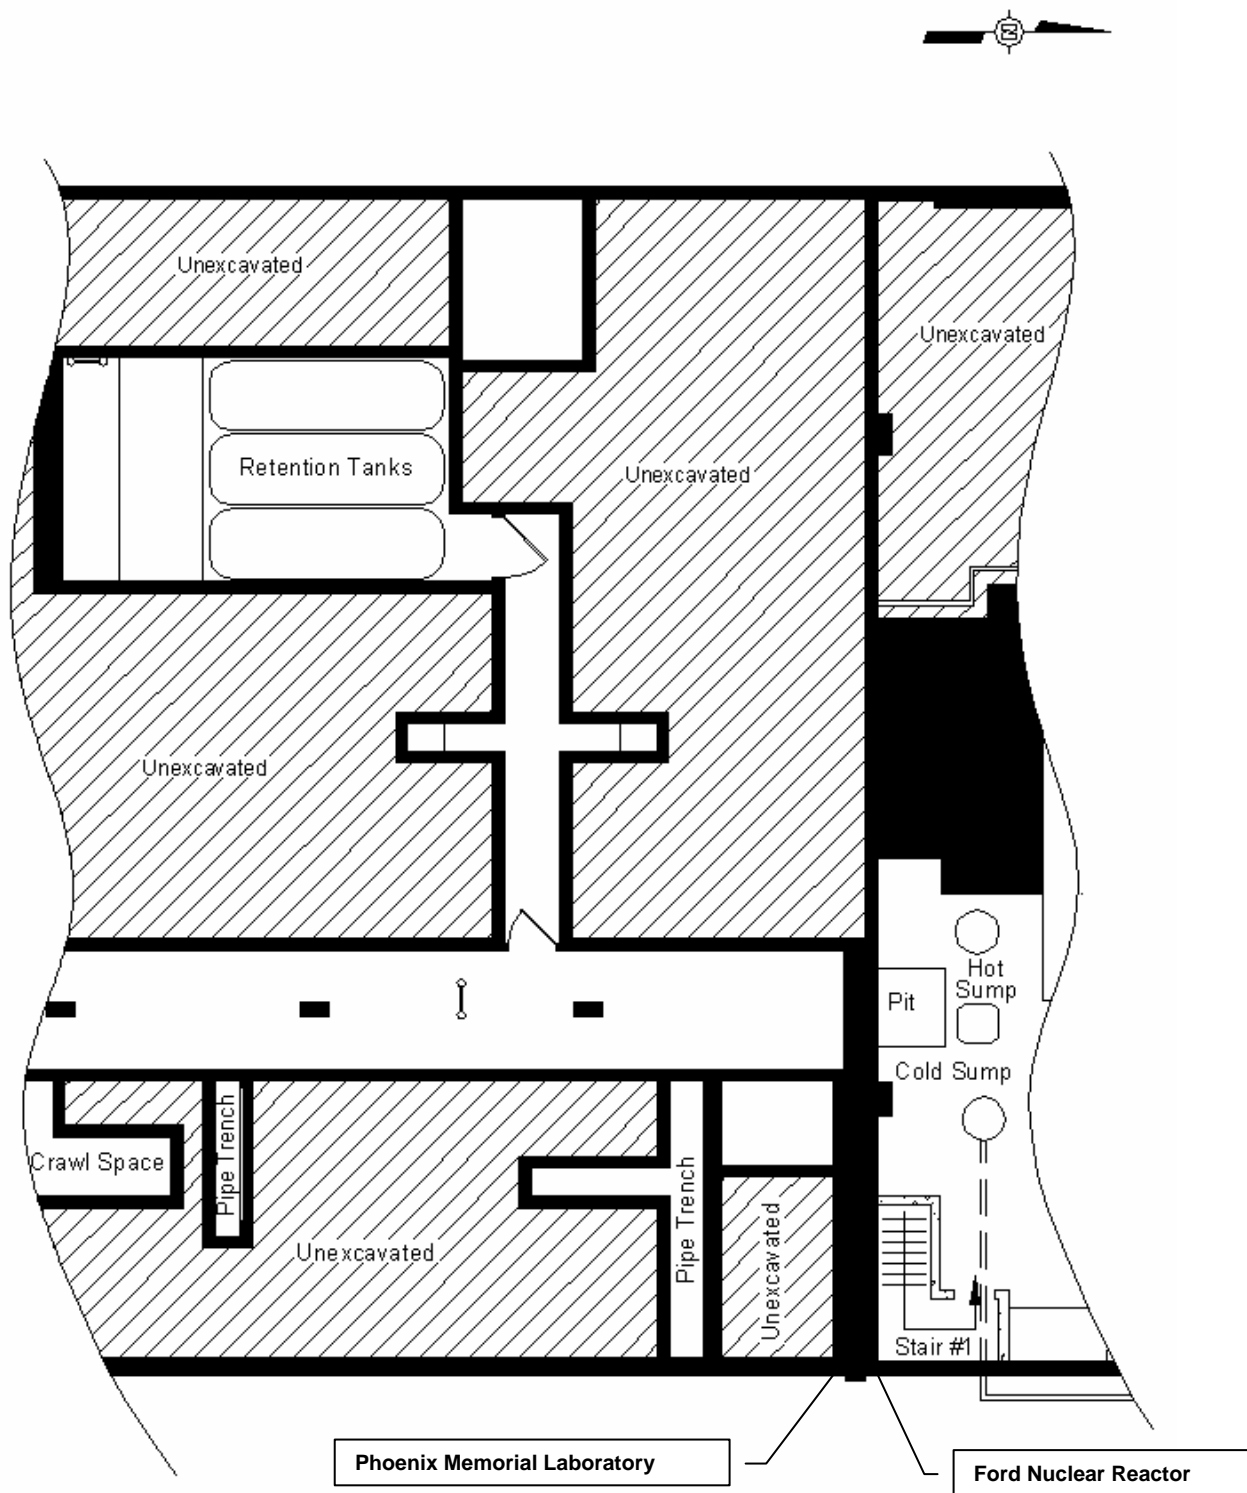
, PHOENIX MEMORIAL LABORATORY FIRST FLOOR - SECTION
